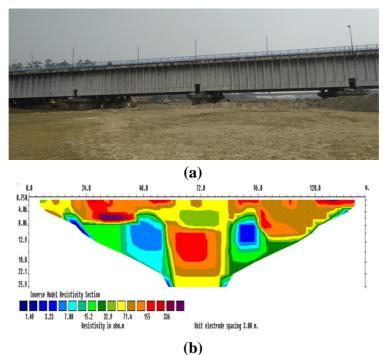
Foundation Signatures Solani Bridge (Parallel to Bridge)
